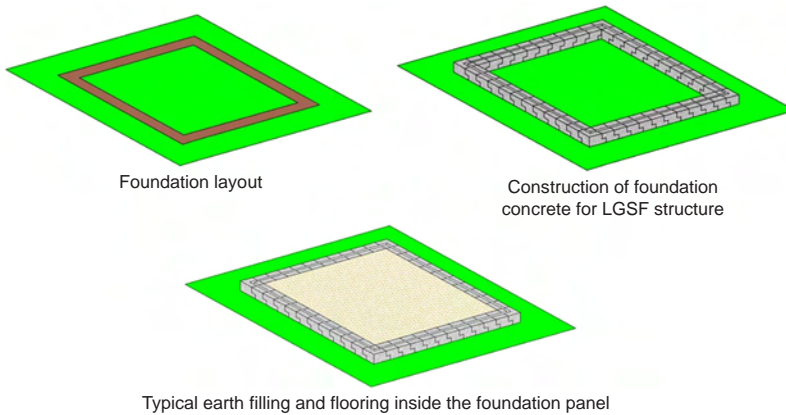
Preparation on foundation for installation of LGSF frames
